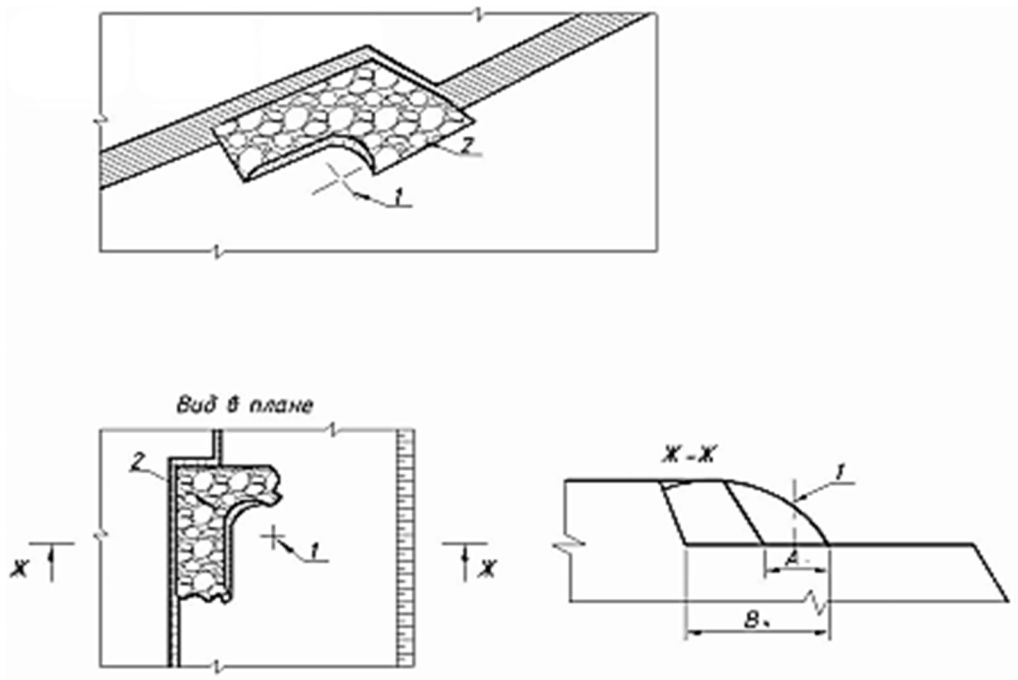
Excavator face in overburden destroyed (exploded) rocks.
